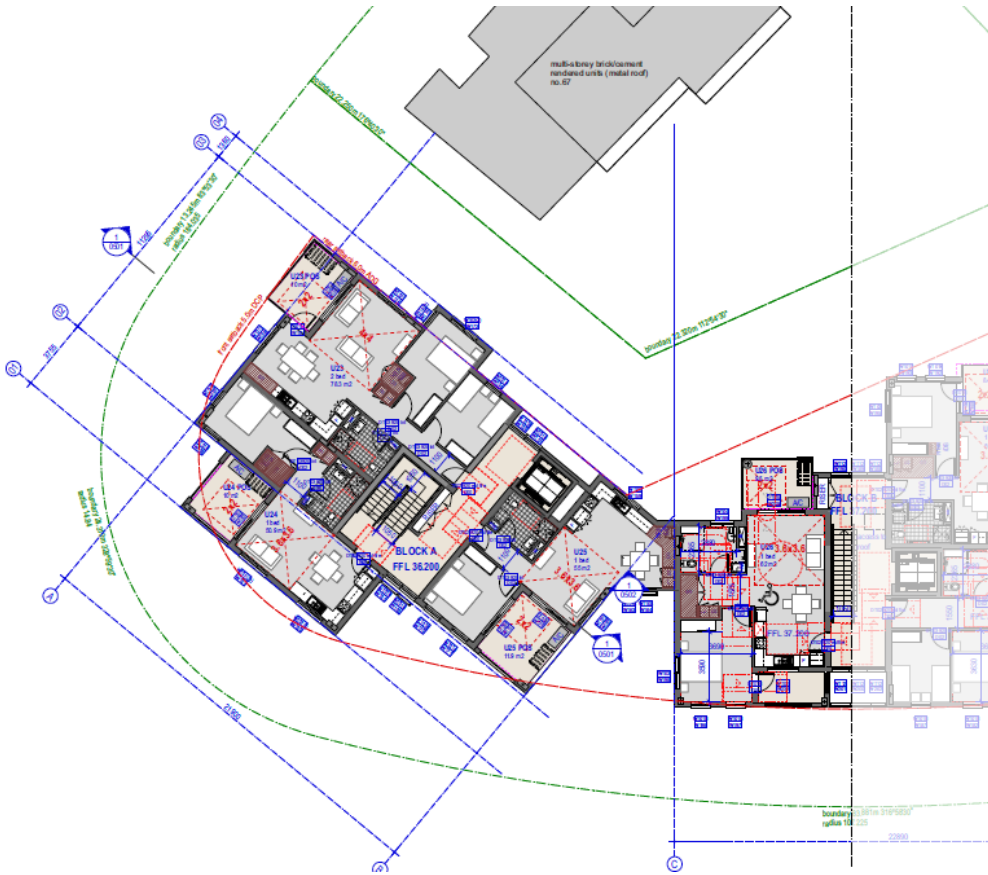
Extract from Architectural Plans – Level 03- Part 1 (Source: Architectural Plans, Kennedy Associates Architects, dated 29/08/2024)
